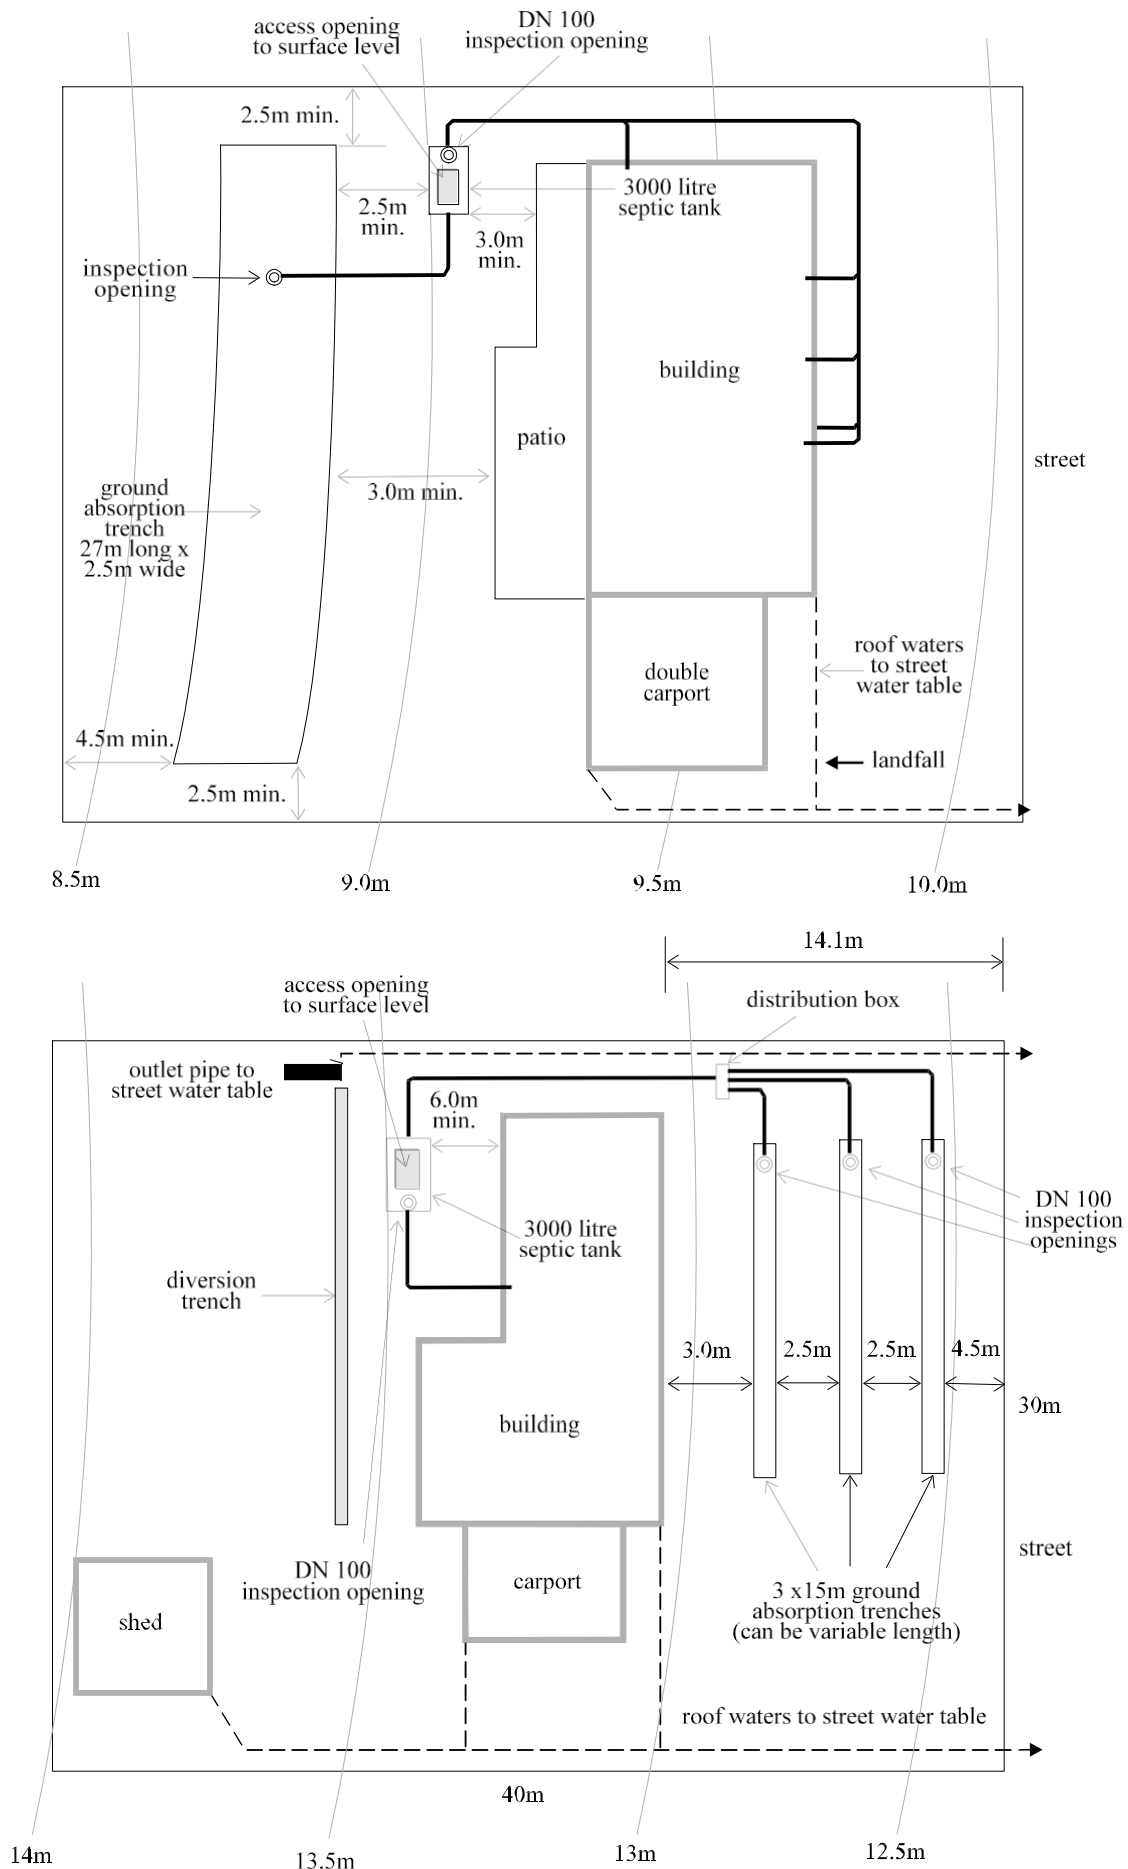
TYPICAL GROUND ABSORPTION SYSTEM LAYOUTS
